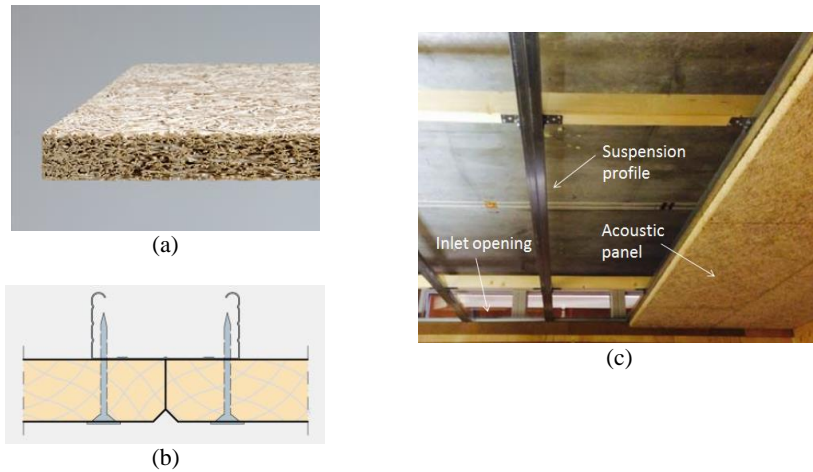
Description of the tested diffuse ceiling system (a) Wood-cement panel (b) Suspension system (c) Diffuse ceiling set-up [50]
